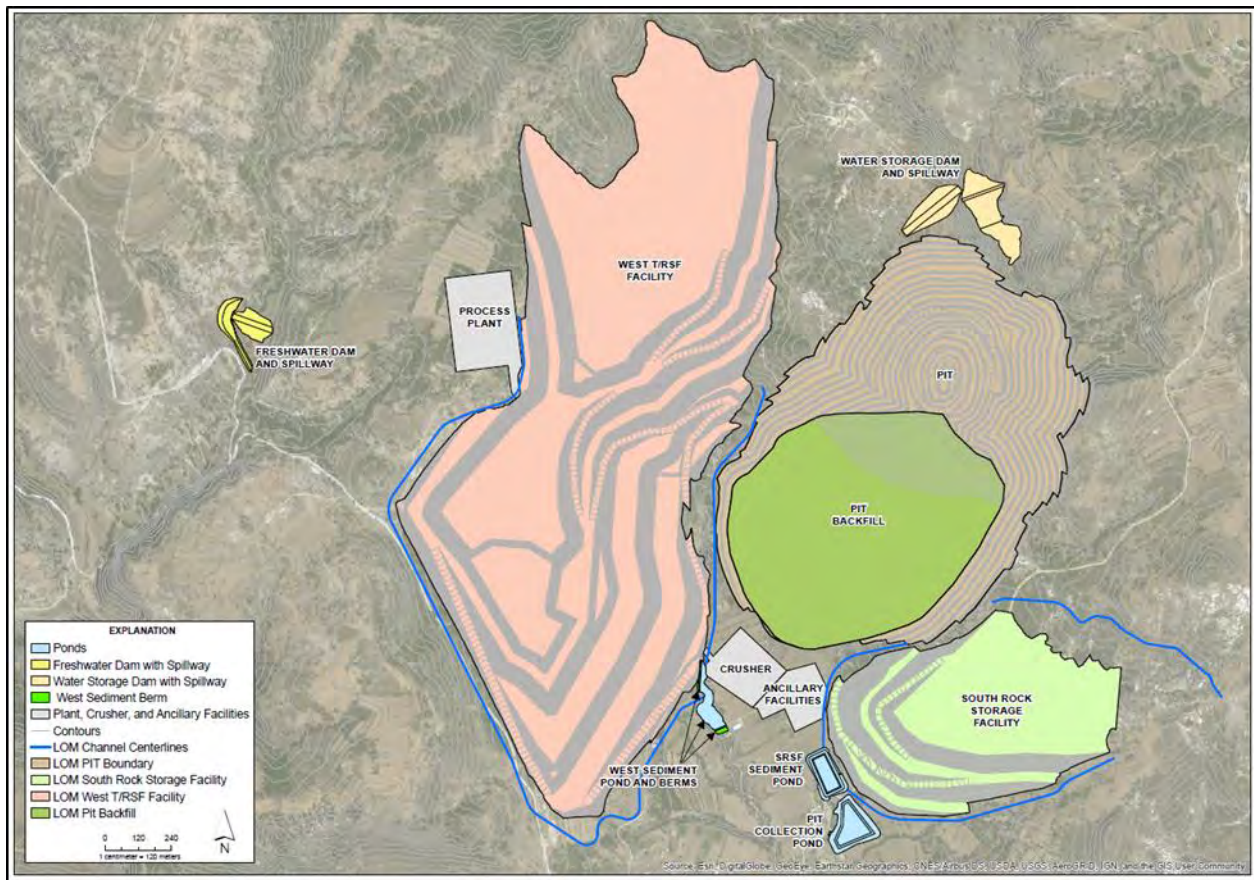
West Tailings and Rock Storage Facility General Arrangement - LOM Author SRK, 24 January 2019.
